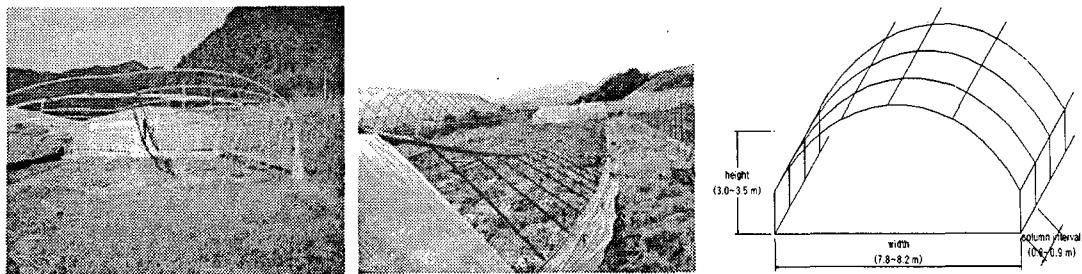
Case of damaged single-span greenhouse at Hapcheon area
